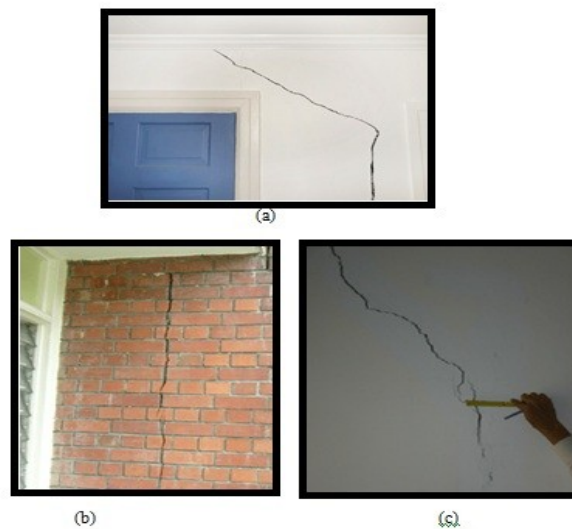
Damage from adjacent construction vibration (www.p-consurvey.com)
